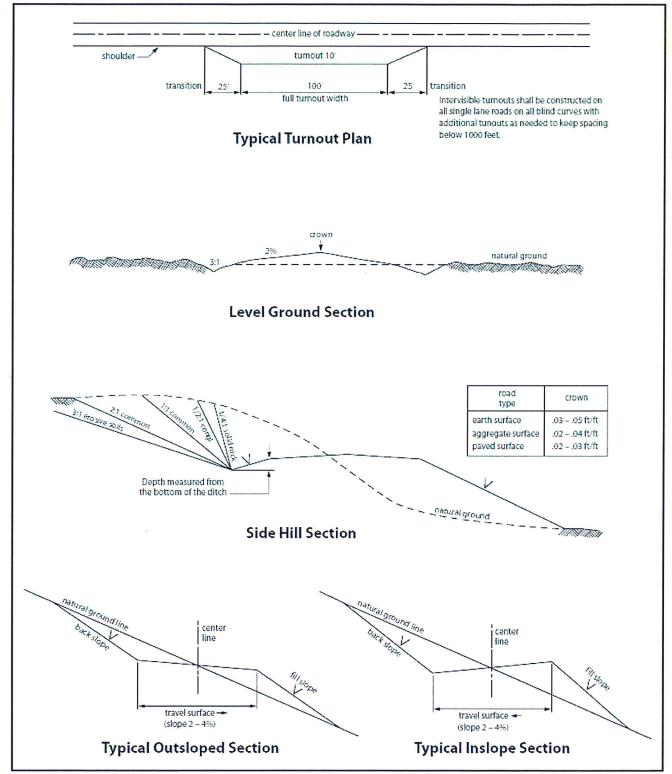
Cross-sections and plans for typical road sections representative of BLM resource or FS local and higher-class roads.
